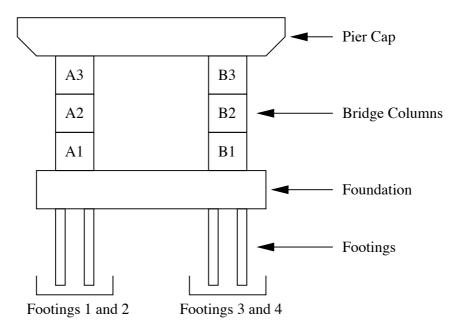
Front elevation view of a bridge pier, foundation and footings.
